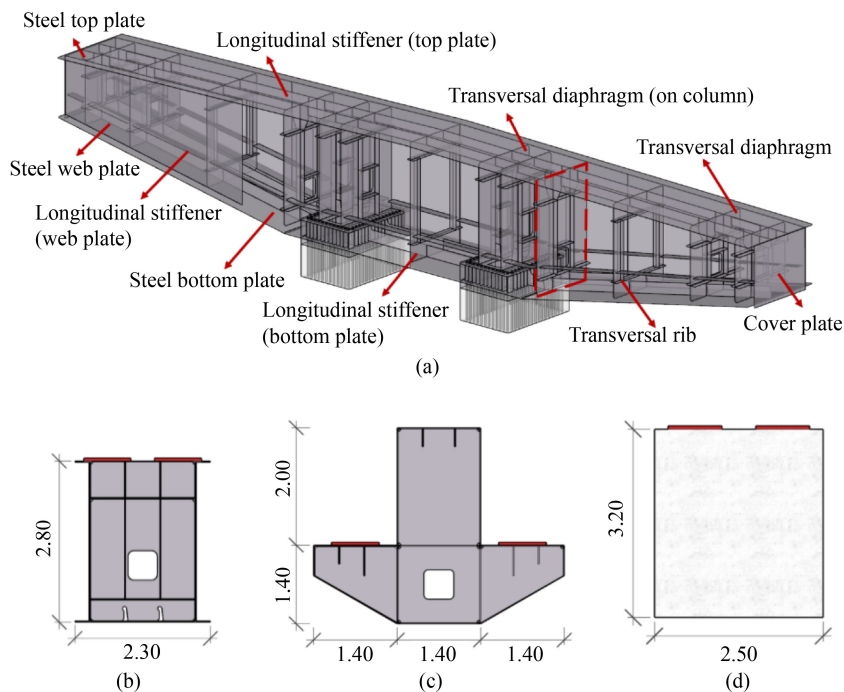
The design of cap beams (unit: m): (a) overall design of steel cap beam; (b) box-shaped (steel); (c) inverted T-shaped (steel); (d) box-shaped (prestressed concrete).
